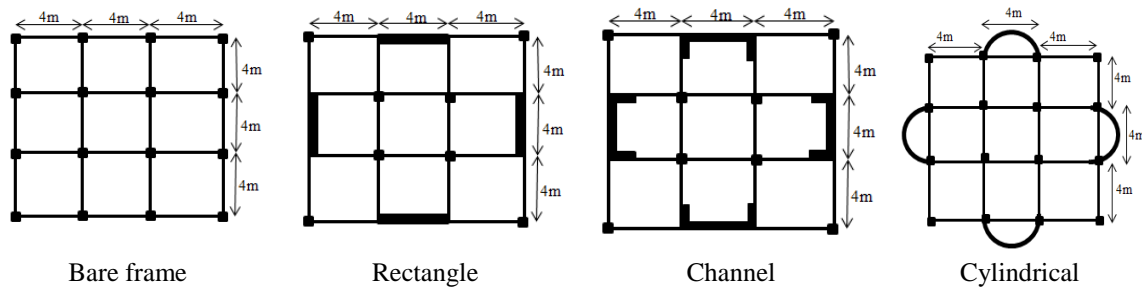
Plan of bare frame and frame with various shape of shear wall.
